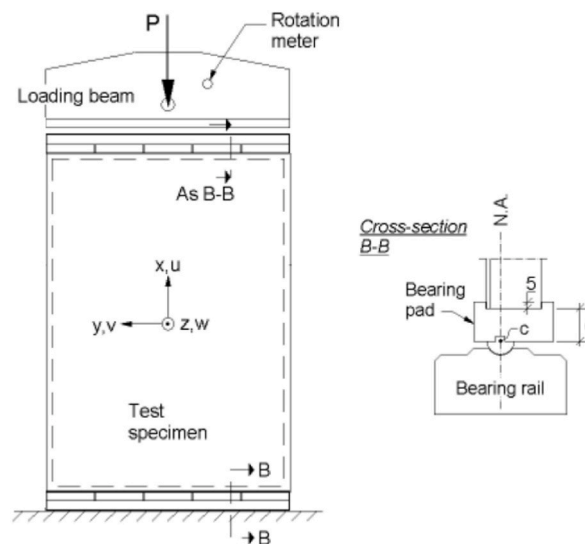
Test setup and cross-section of cylindrical thrust bearings at the loaded ends in the reference experiments [3].
